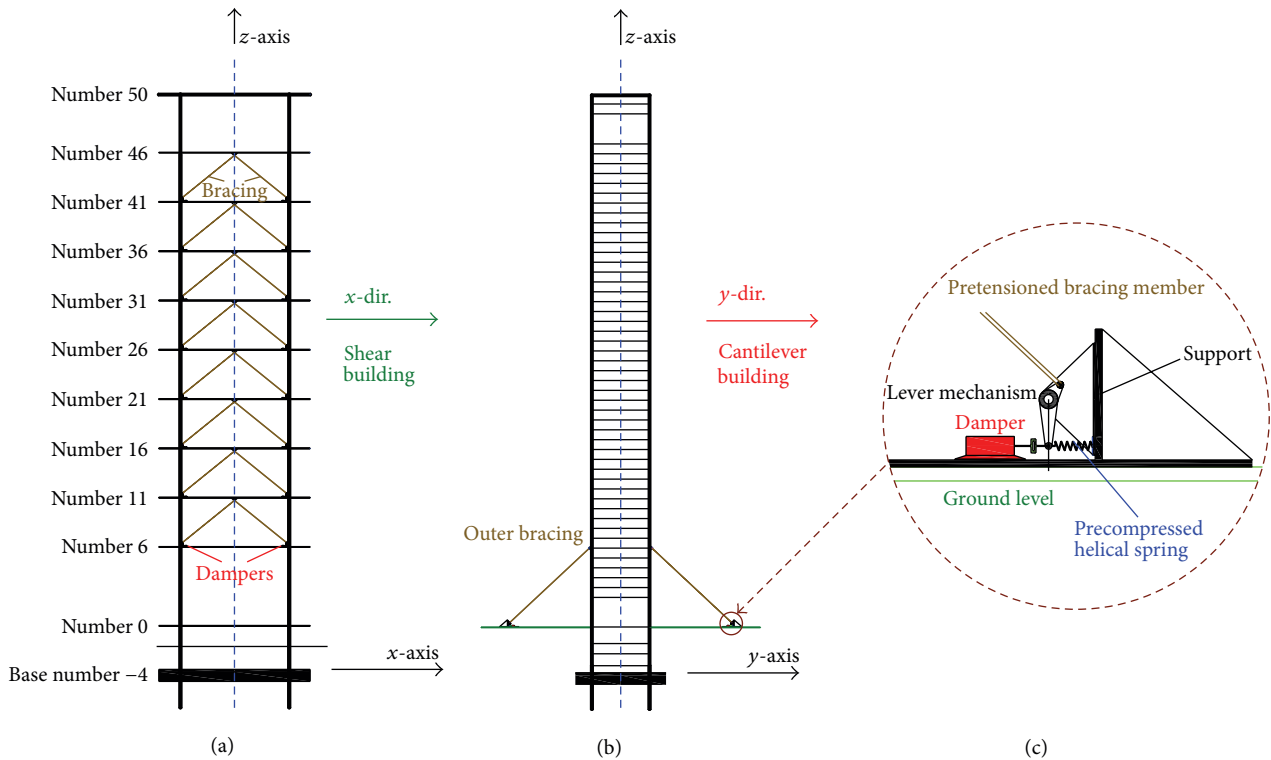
Proposed configuration of the MR dampers with bracing system: (a) bracings with dampers between adjacent floors for shear buildings; (b) outer bracings with dampers for cantilever and slender buildings; (c) damping unit consisting of a viscous damper, helical spring, and a lever mechanism for drift amplification across the damper.
